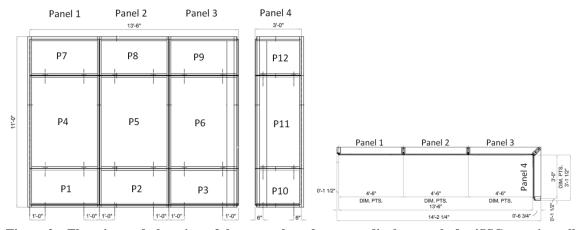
Elevation and plan view of three panels and a perpendicular panel of a 4SSG curtain wall system (recreated from drawing provided by Bagatelos Architectural Glass Systems Inc.)
